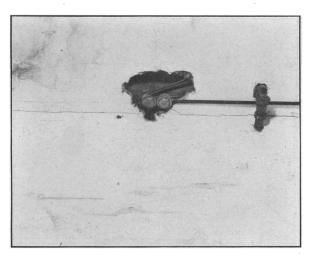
,-DEFECTIVE CEILING AROUND ELECTRIC WIRING.
